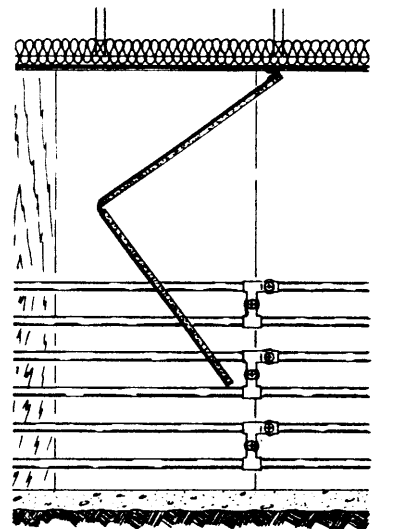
DROP PANELS OR SURTAINS AND HOT WATER PIPE CROSSOVERS FOR PARTIAL ROOM BROODING
